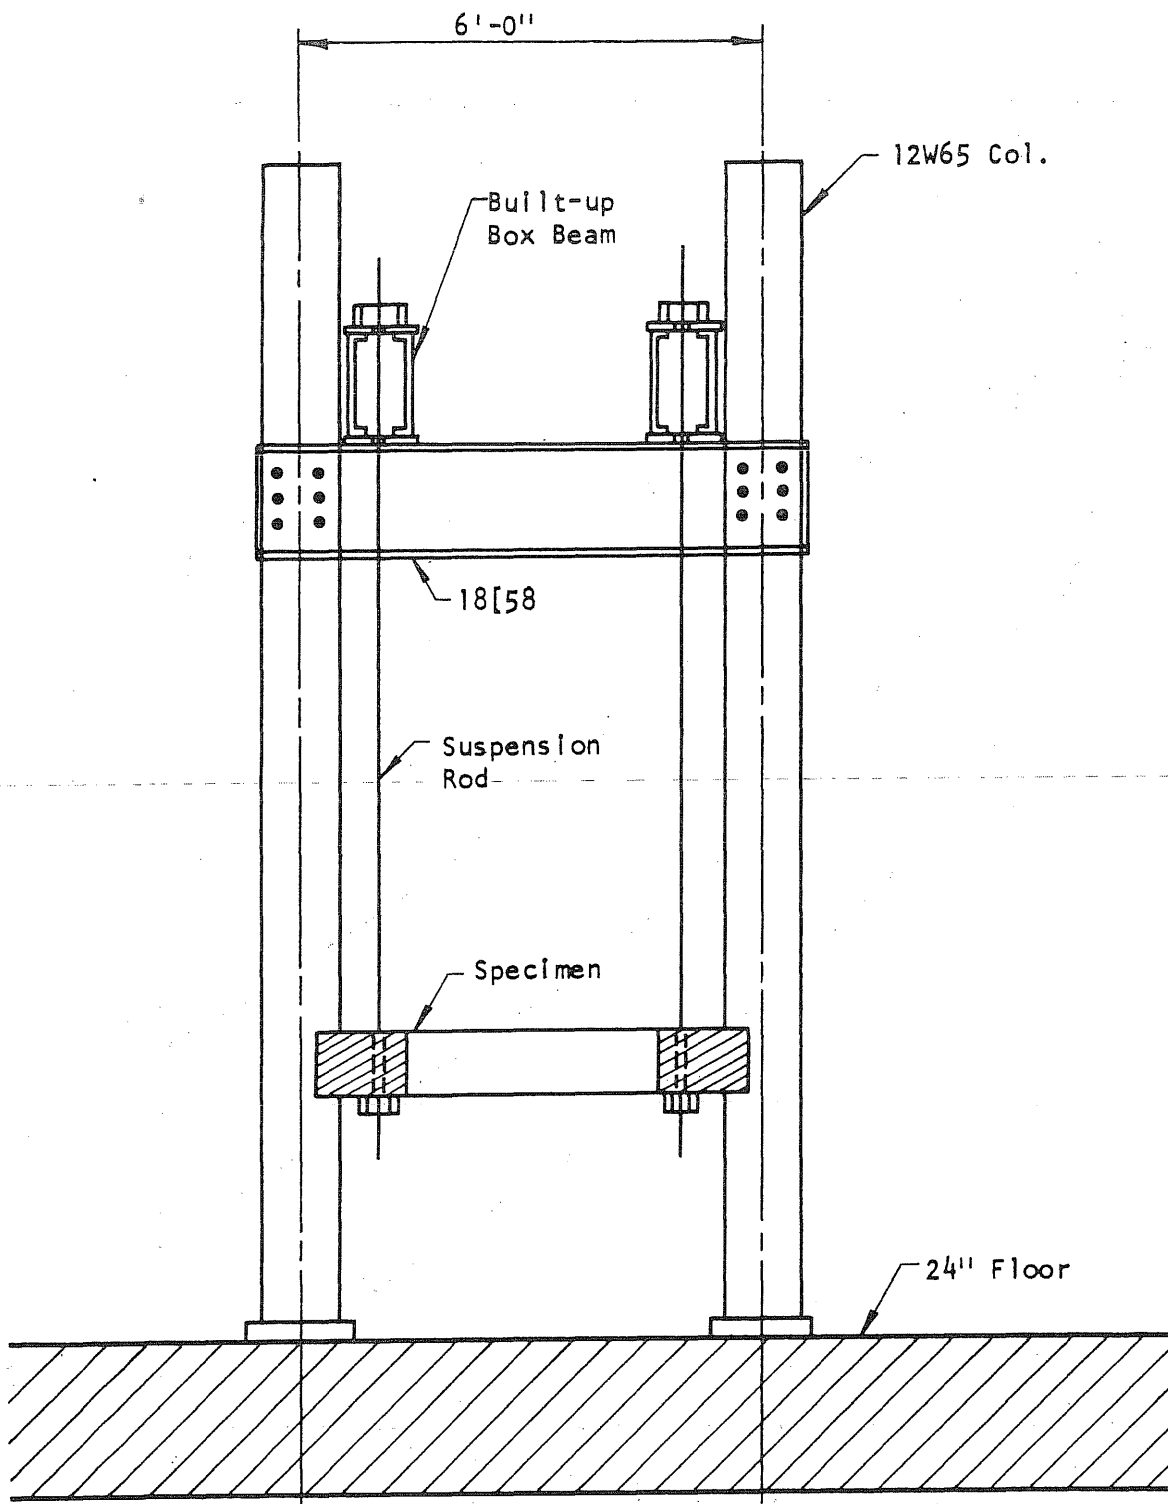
END ELEVATION OF TEST FRAME WITH SPECIMEN IN PLACE
